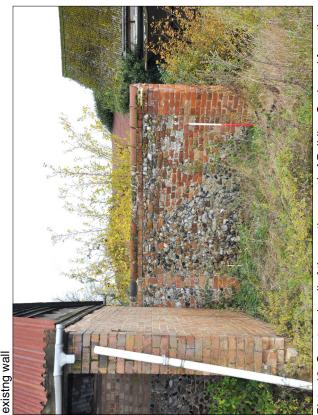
Courtyard wall of the southern end of Building C, viewed from the east
